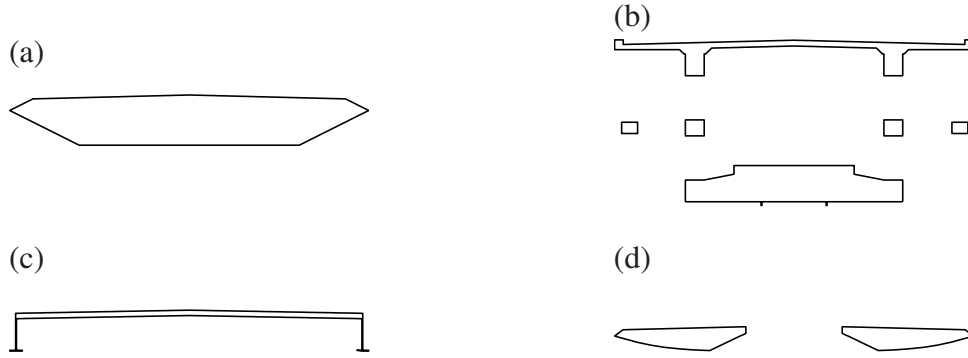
Cross-sections of the four bridge decks (scaled to unity chord) which are investigated in the present study. (a) Great Belt East bridge, mono box girder bridge, (b) Øresund bridge, double deck truss bridge, (c) Busan-Geoje bridge, plate girder bridge, (d) Stonecutters bridge, twin box girder bridge.
